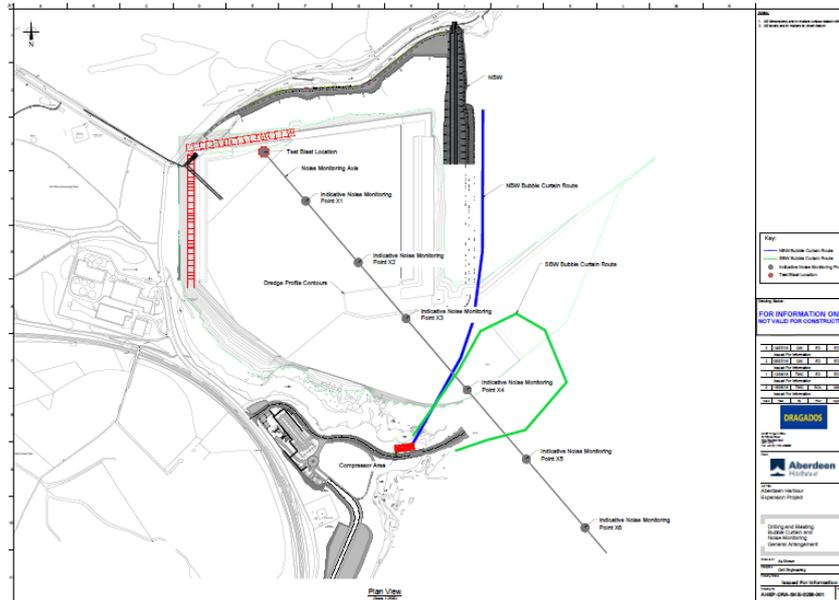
Plan view of Nigg Bay showing bubble curtain construction (blue and green lines)
